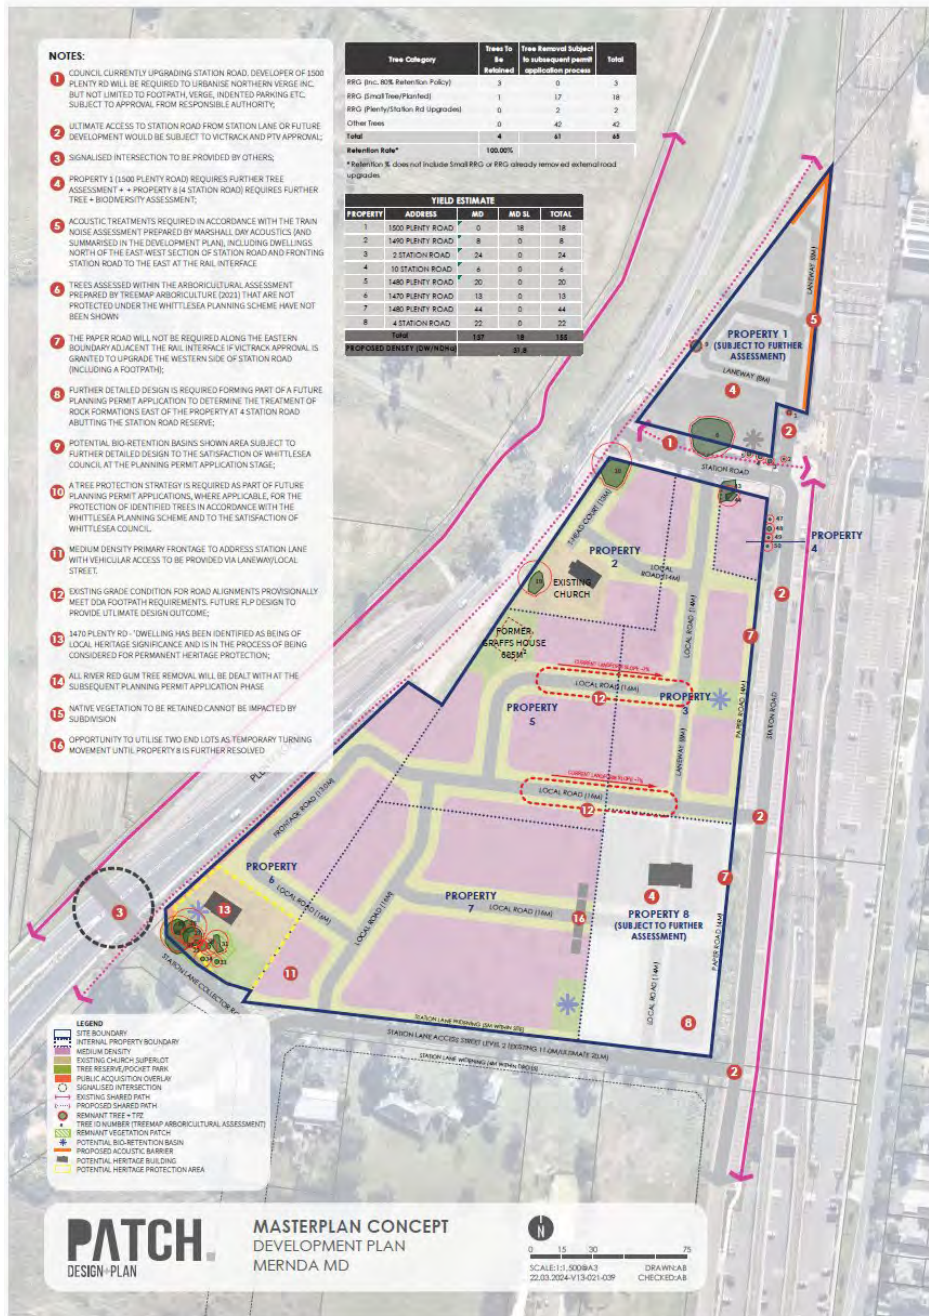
MASTERPLAN CONCEPT DEVELOPMENT PLAN PREPARED BY PATCH DESIGN+PLAN
